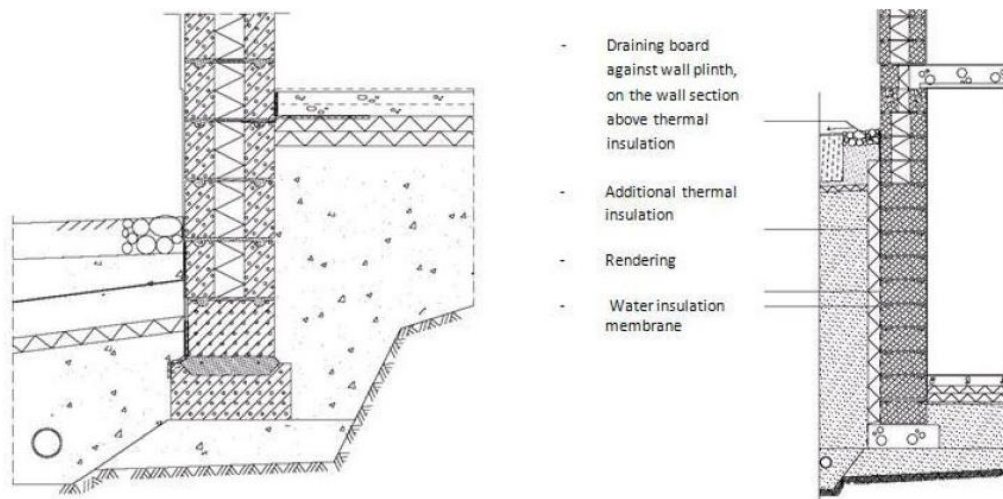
Example of additional thermal insulation of floor slab /1/
